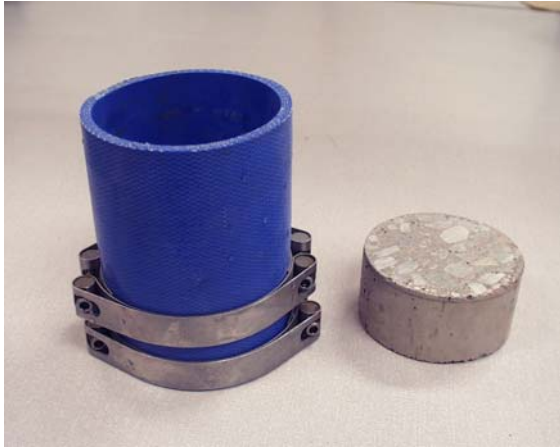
A rubber sleeve was assembled to the specimen [4].
